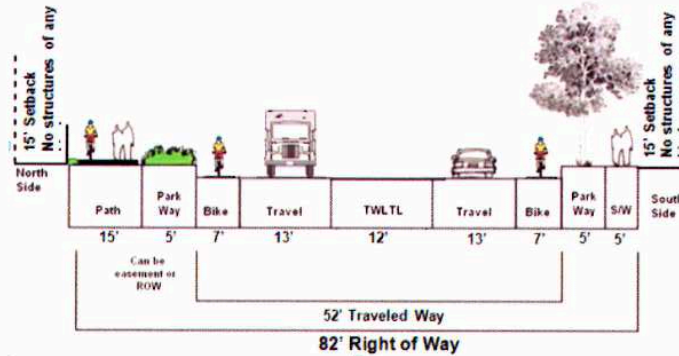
Arterial – Ultimate Buckley Road Cross-section in Developed Areas
